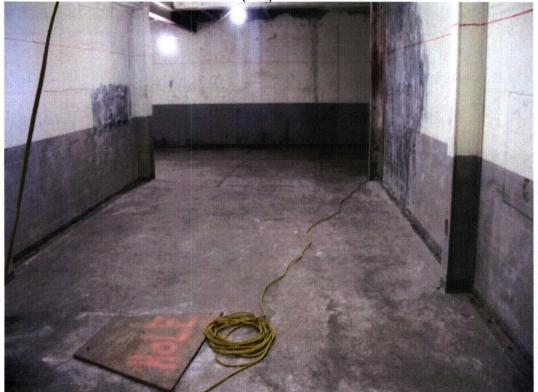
, SEB Mezzanine Room 14 Landing (Survey Unit SE-2-3)
